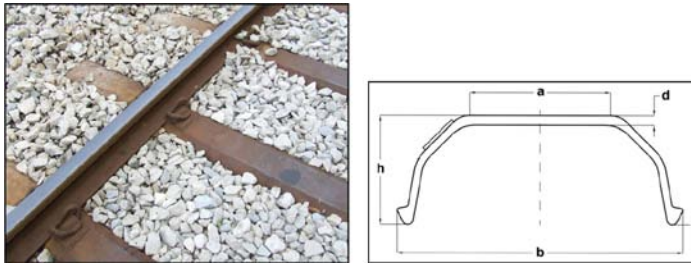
Railway track on Šapjane station and cross section of steel sleeper
